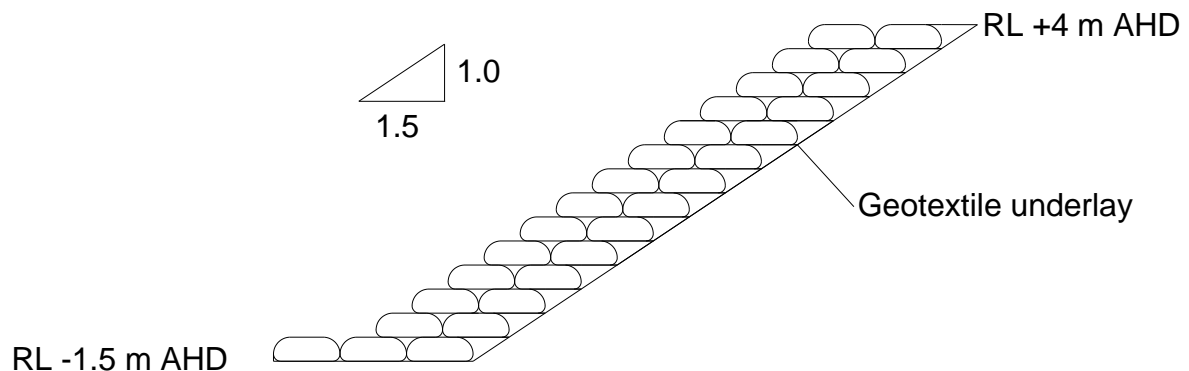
Preliminary Sketch of Seawall Cross Section
